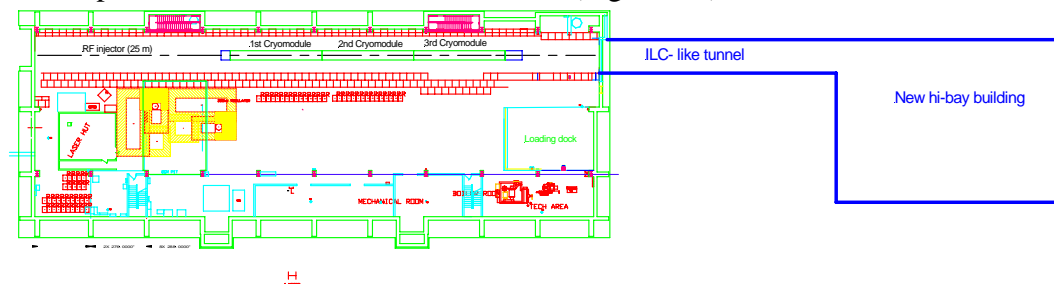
A schematic layout for the final stage (FY09 and beyond) of the NML facility.
